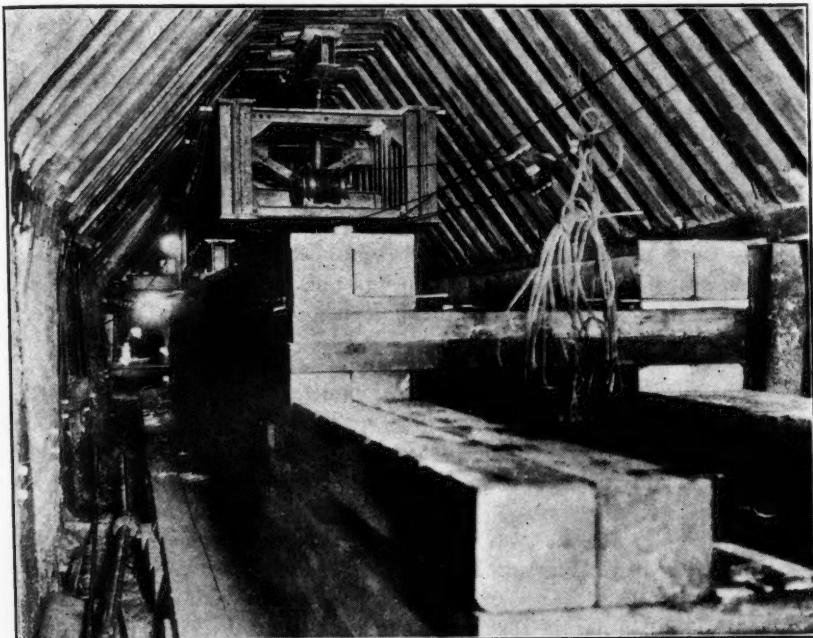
VIEW OF CANTILEVER NEEDLE-BAR ON SUB-BENCH, MOFFAT TUNNEL, WEST PORTAL.
